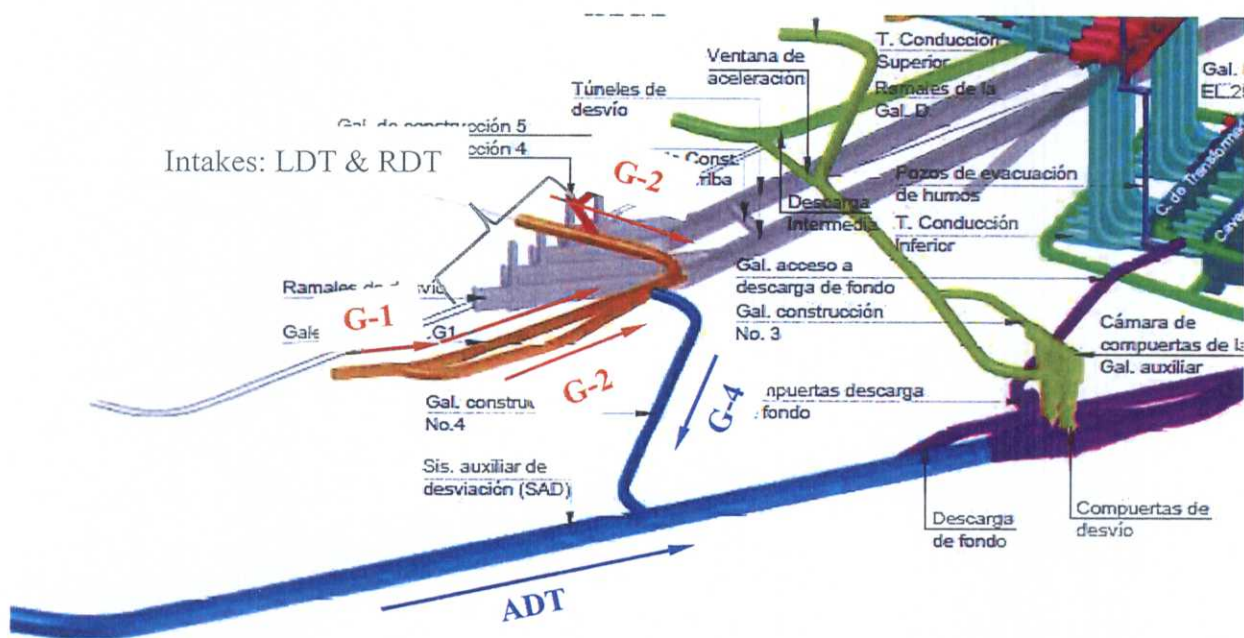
General Layout showing the location of LDT and RDT Intakes and Construction Galleries G-1, G-2 and G4
